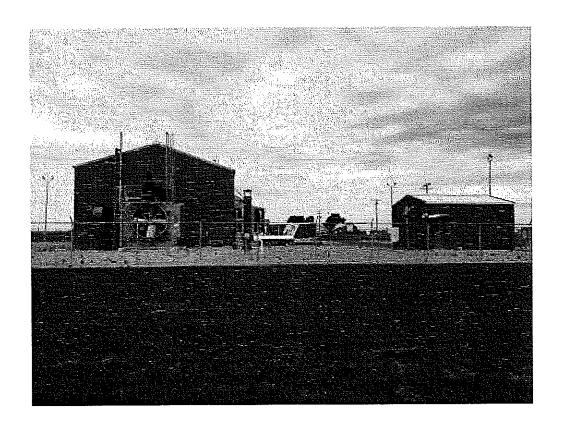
(Fig 2.): Site inspection photo. Perspective is facing north towards 9501 Sebewaing Road from the Huron Compressor Station property.
